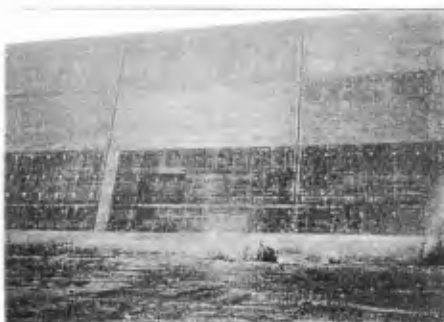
(b) Air blow occurring from a gap between the caisson and backfill stones.
